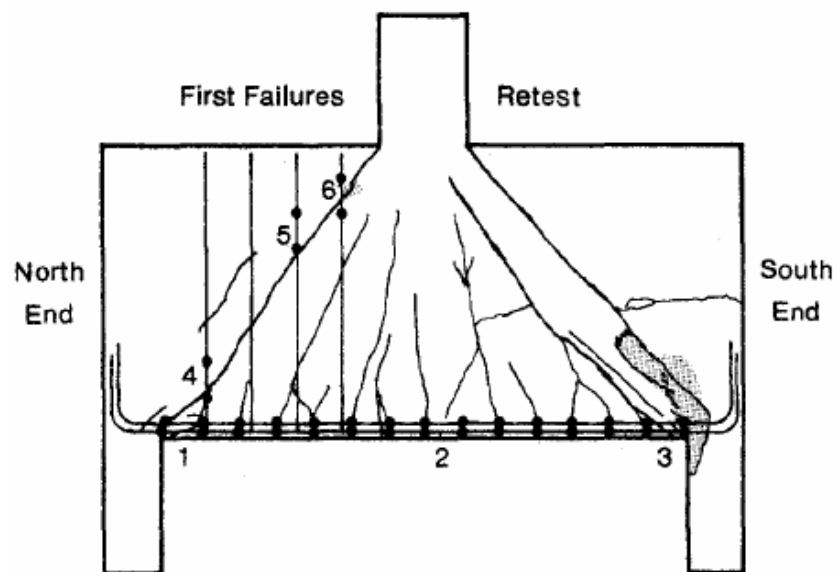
Crack pattern at failure of computer model of beam BM 1/1.0 model with web reinforcement
